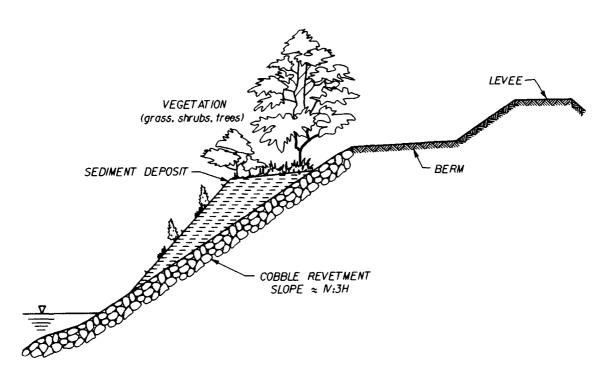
Cross section through a typical vegetated sediment deposit on a cobble revetment
